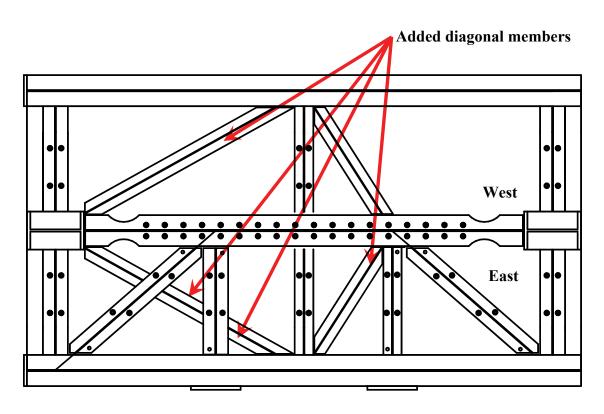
Layout of the Intermediate Floor Truss Strengthened after Test 1
